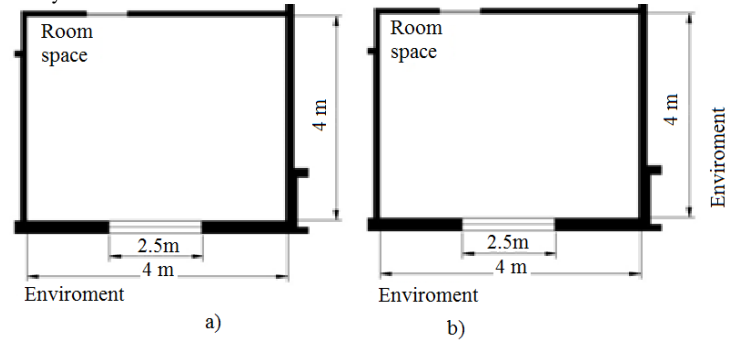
Virtual room model: a) one exterior wall; b) two exterior walls
